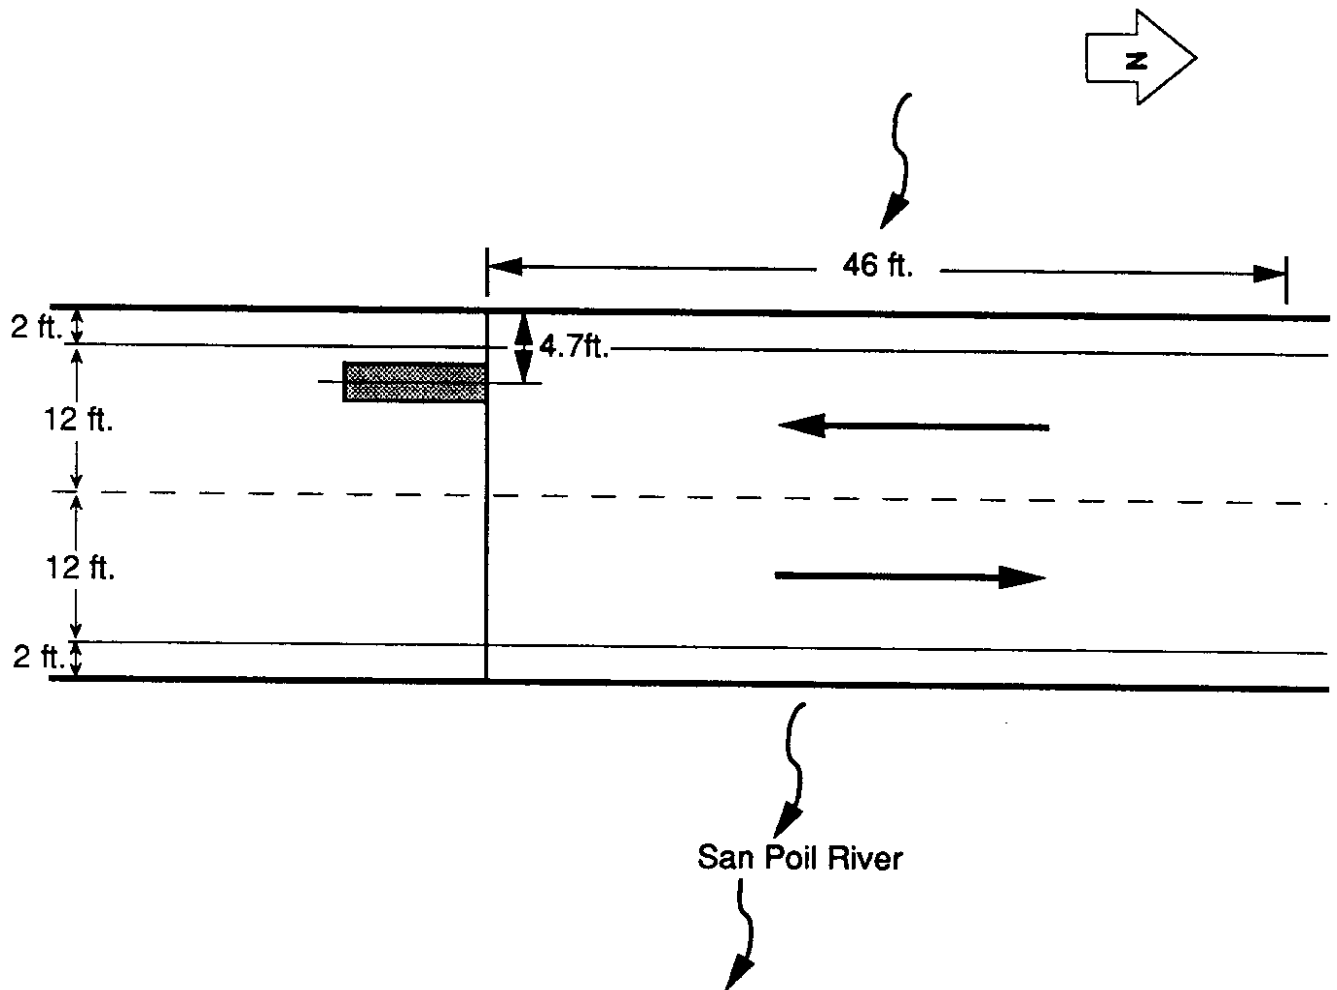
Location of Test Section in Southbound Lane of San Poil River Bridge (M.P. 106) (21/311)
